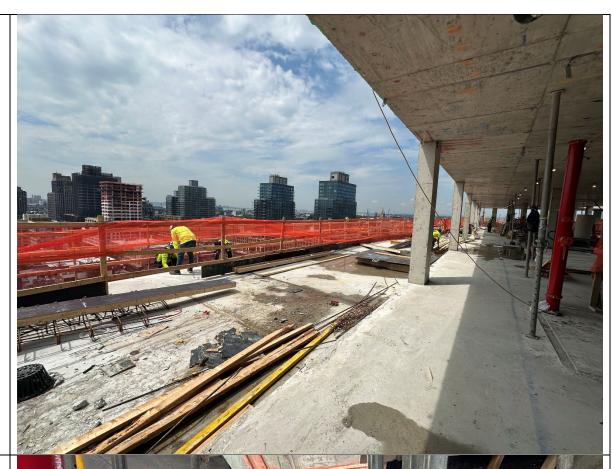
Representative photo of placing rebar for staircases on the 15th floor leading to 16th floor.
